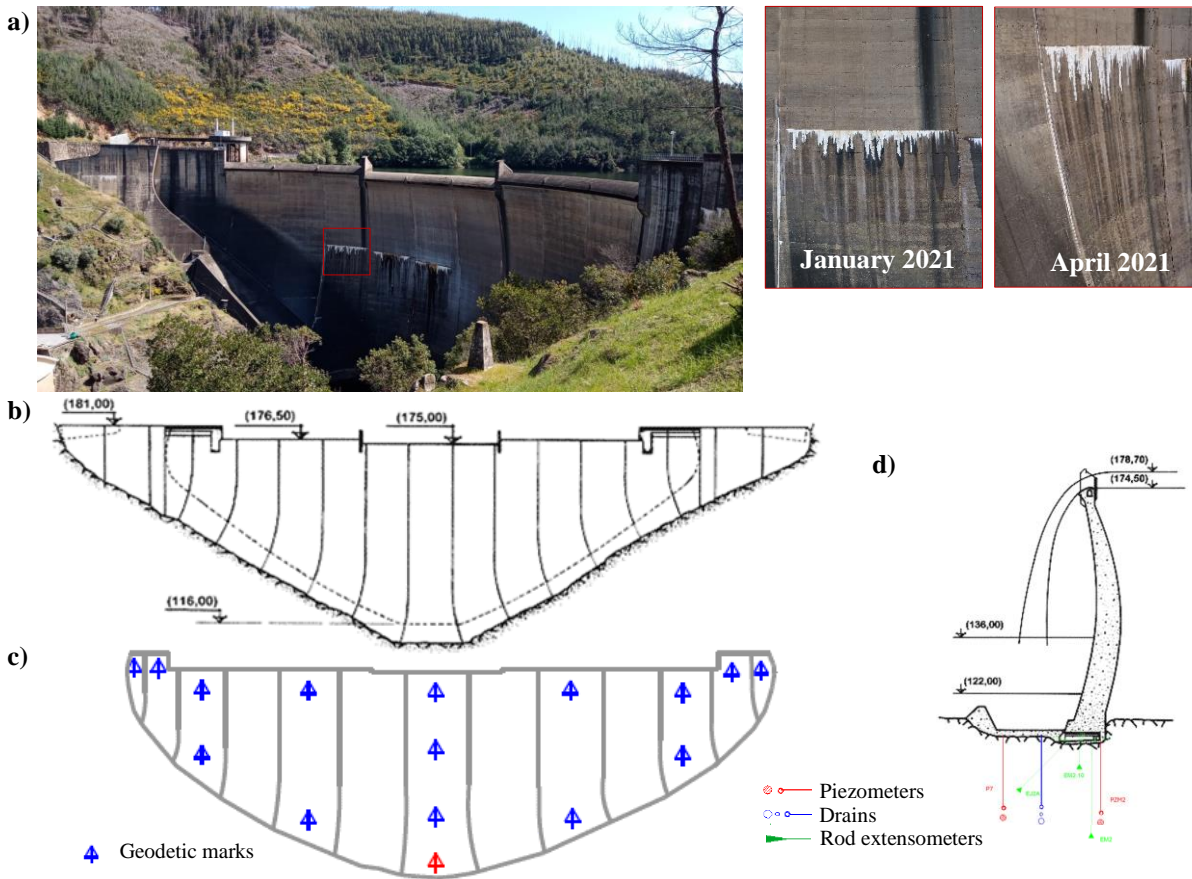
Bouçã dam: a) downstream view and detail of the horizontal crack evolution [2]; b) downstream elevation; c) observation system - geodetic marks on the downstream face (from the geodetic triangulation network) and, d) cross section with location of drains, piezometers and rod-type extensometers.
